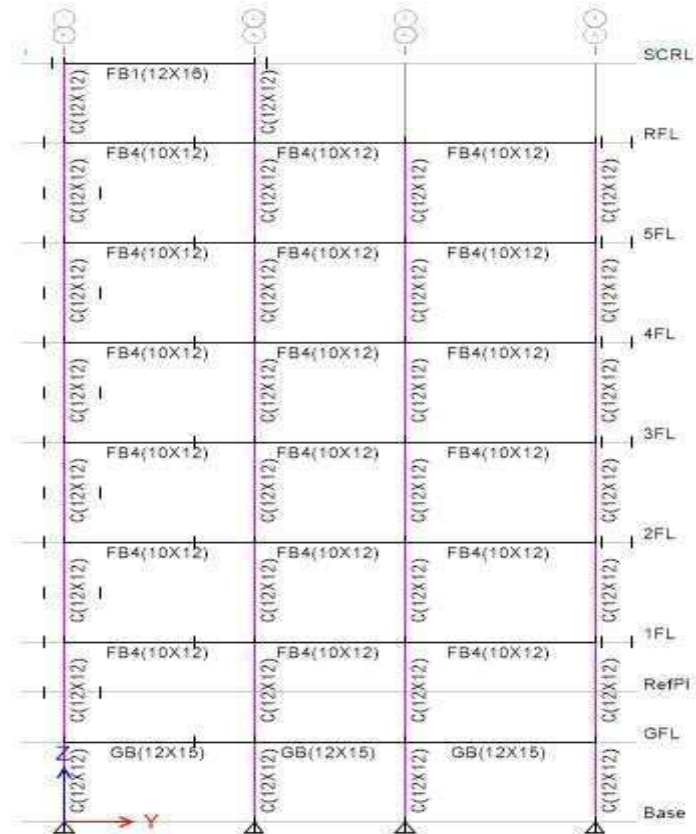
Elevation View zone-4 ZONE-4 $f'c = 4000$ psi and increase frame section ALL frames are passed
